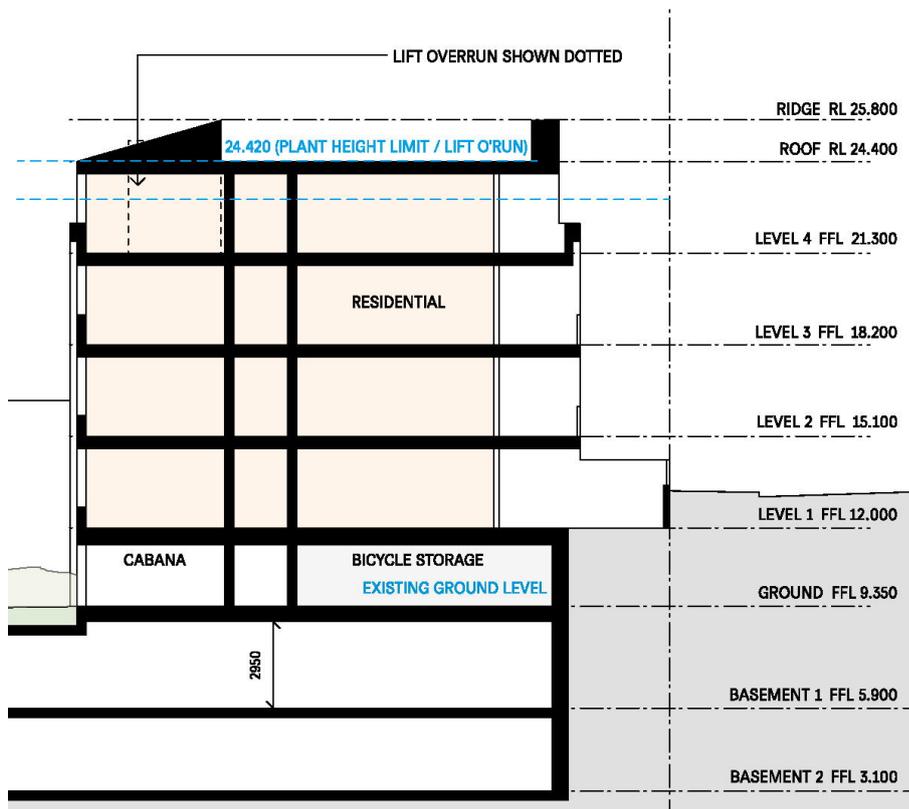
Section DD illustrating the majority of the ground floor is now located at or above the existing natural ground level
